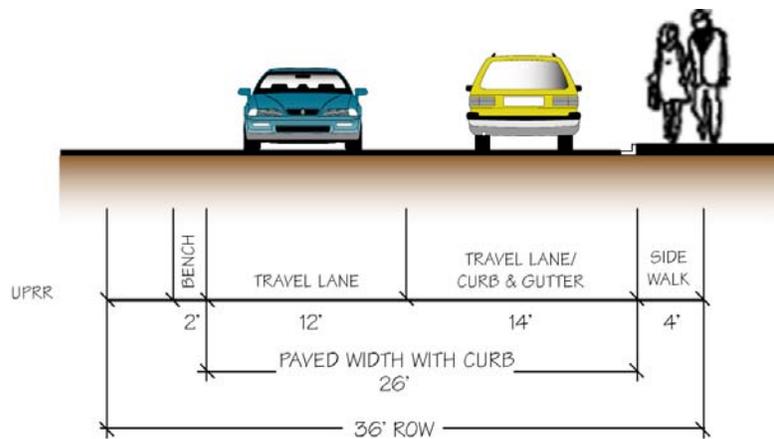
Parcel 11 Access Road (Section F-F from Figure 5-1)
